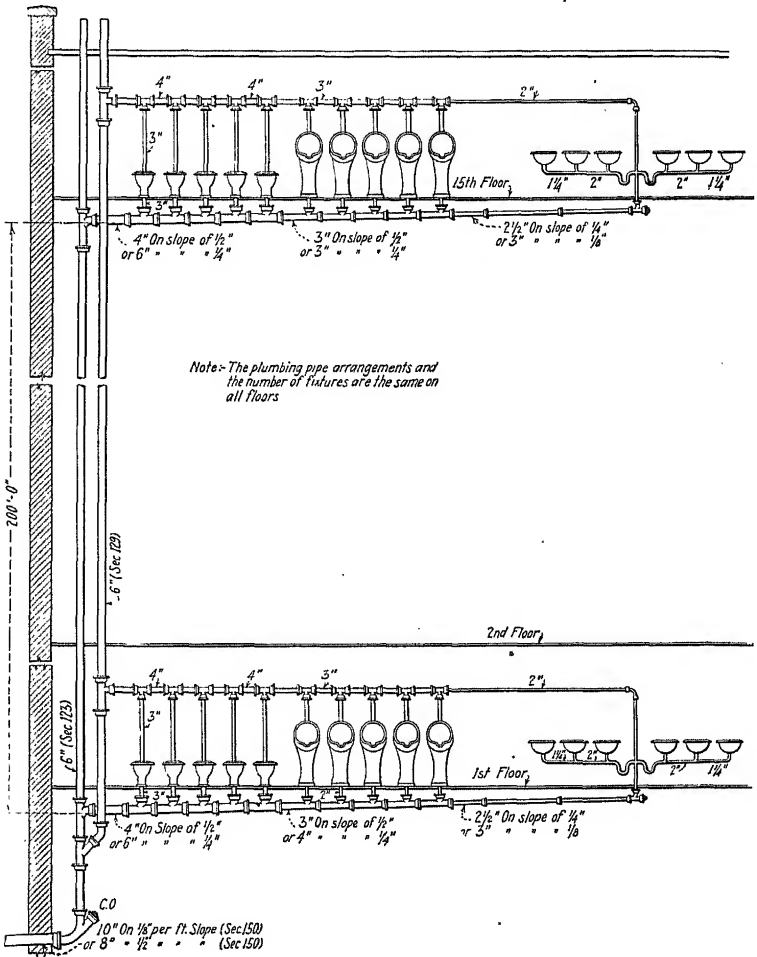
Illustrating vent and drainage pipe installation in a tall building. The sections referred to are in the Model Plumbing Code, recommended by the Illinois Department of Public Health.
